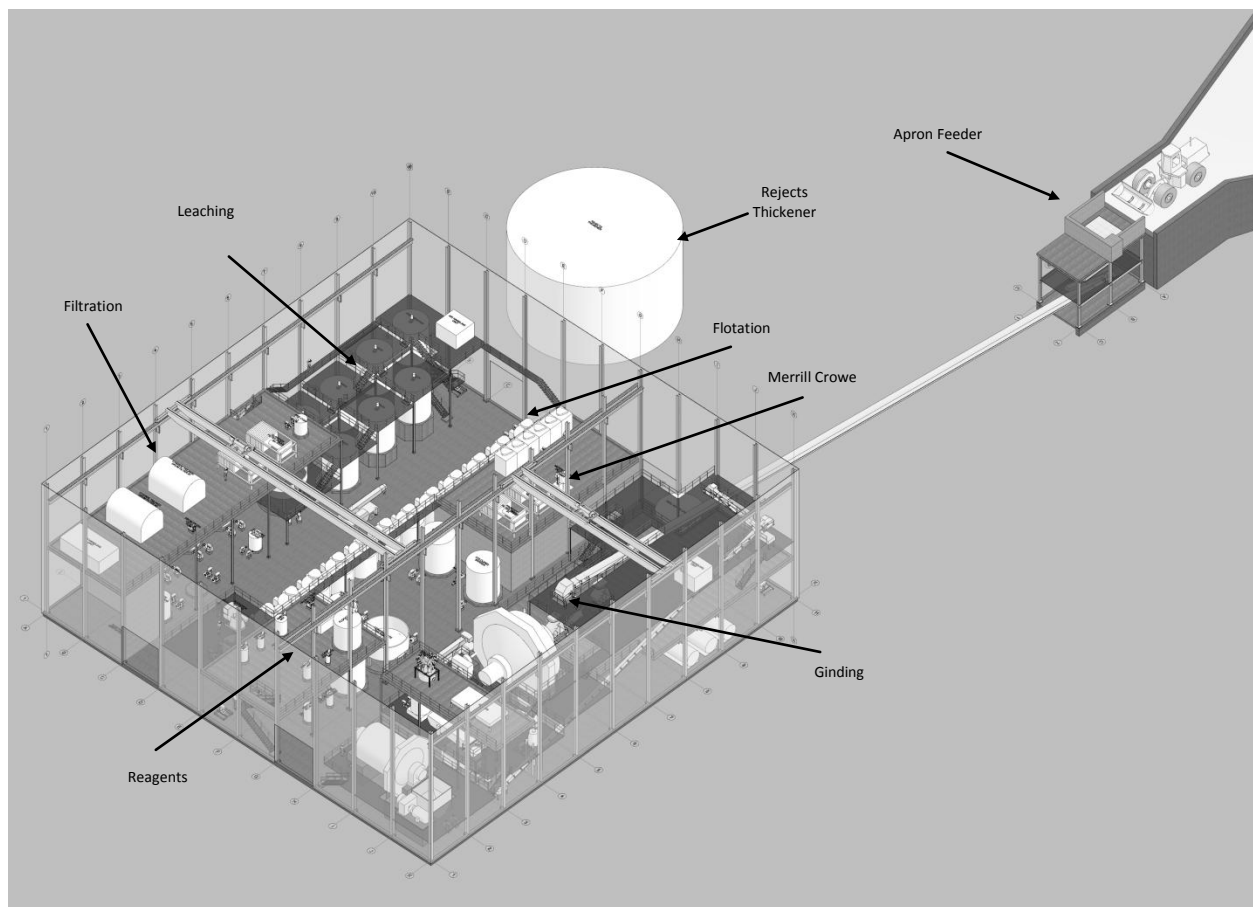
Isometric of the Preliminary Mill Plant Layout
